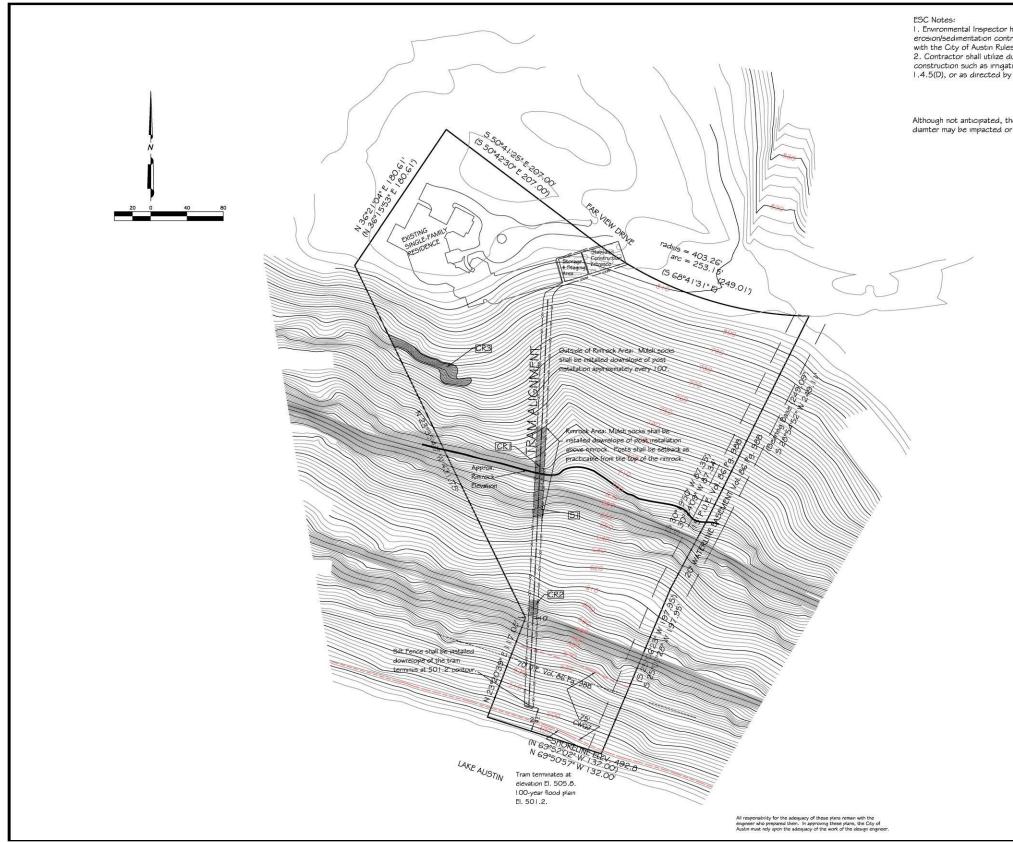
Site Plan and Erosion Control Plan for 3337 Far View Drive
